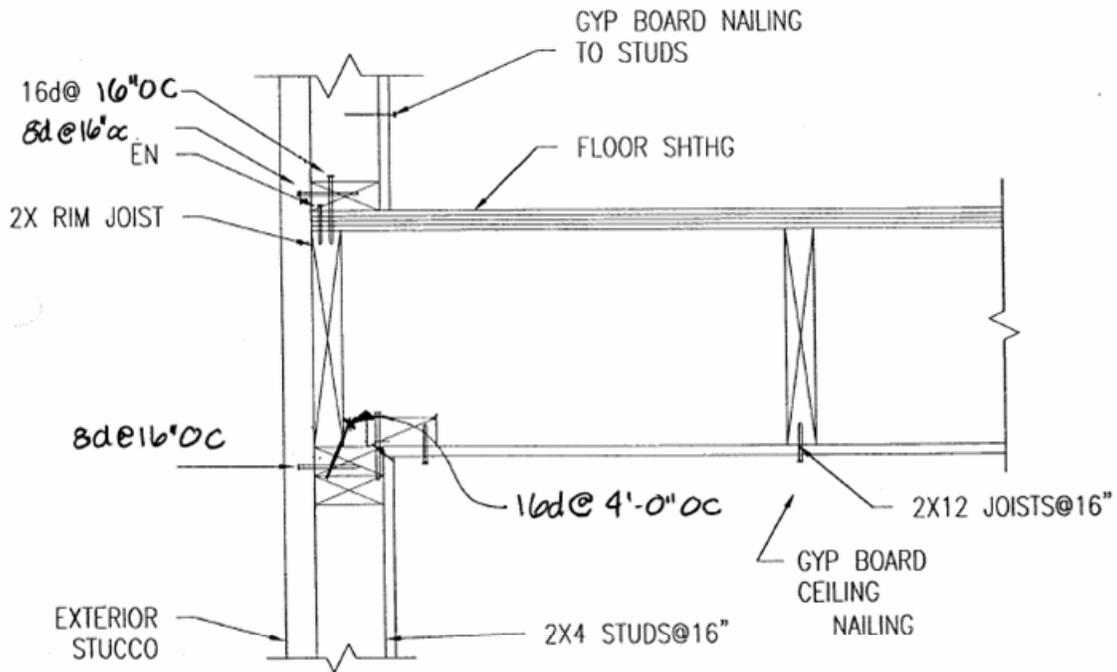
Index building 4 floor edge joists parallel (detail 5-S2)
